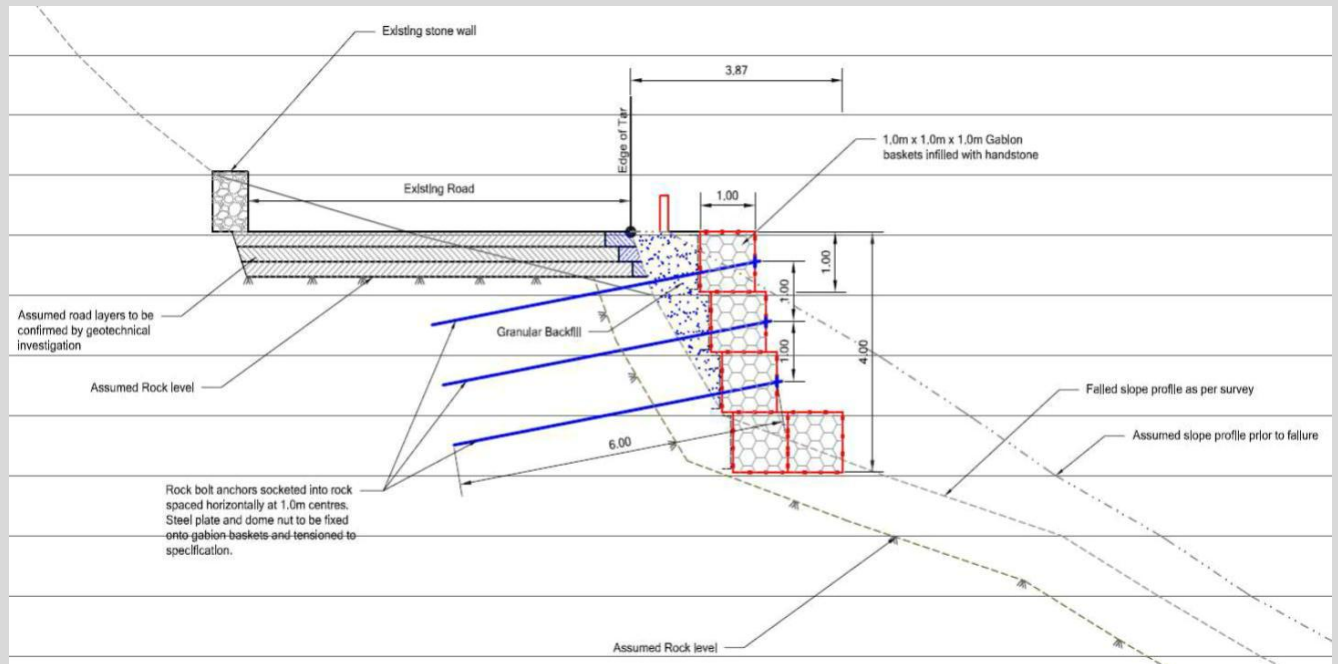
Cross-section of the proposed anchored gabion wall (Ingerop, 2024)
